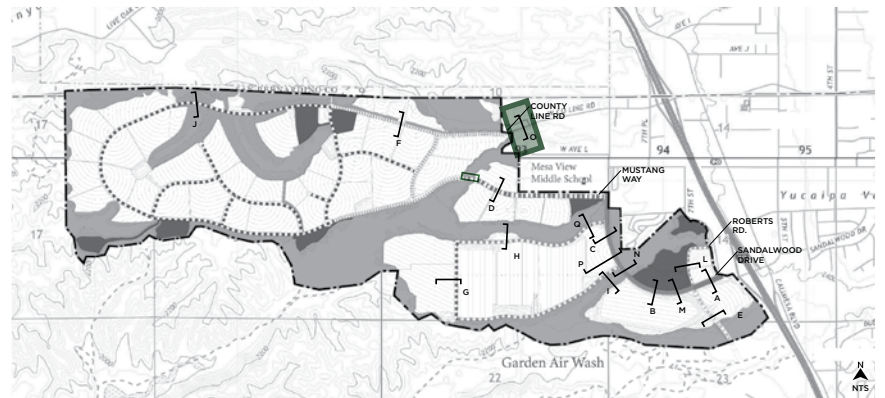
ENLARGEMENT DIVIDED COLLECTOR STREET SECTION O
